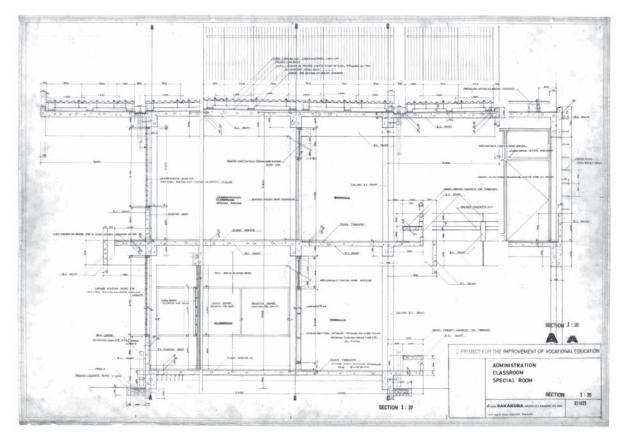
Junzo Sakakura Architects & Engineers, 1967, Details of long cantilevered eaves and roof insulation system at Administration, Classroom and Special room building. © The National Archives of Modern Architecture, Agency for Cultural Affairs, Japan.
